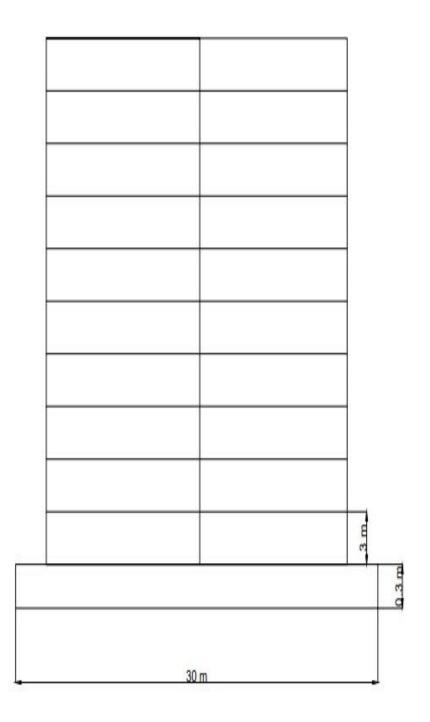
Skeletal Building Elevation with Raft Foundation
